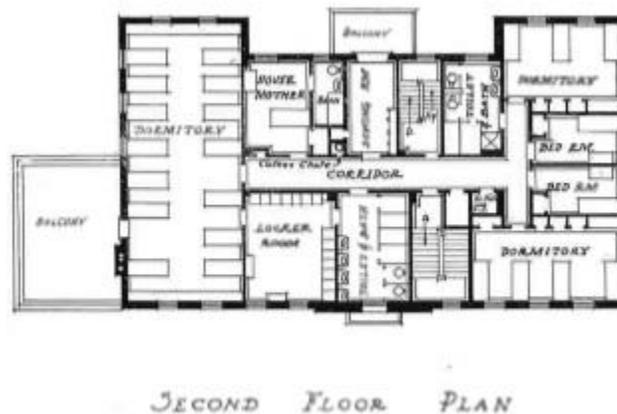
Girls' Building - 2nd Floor (Institutional Homes for Children).
